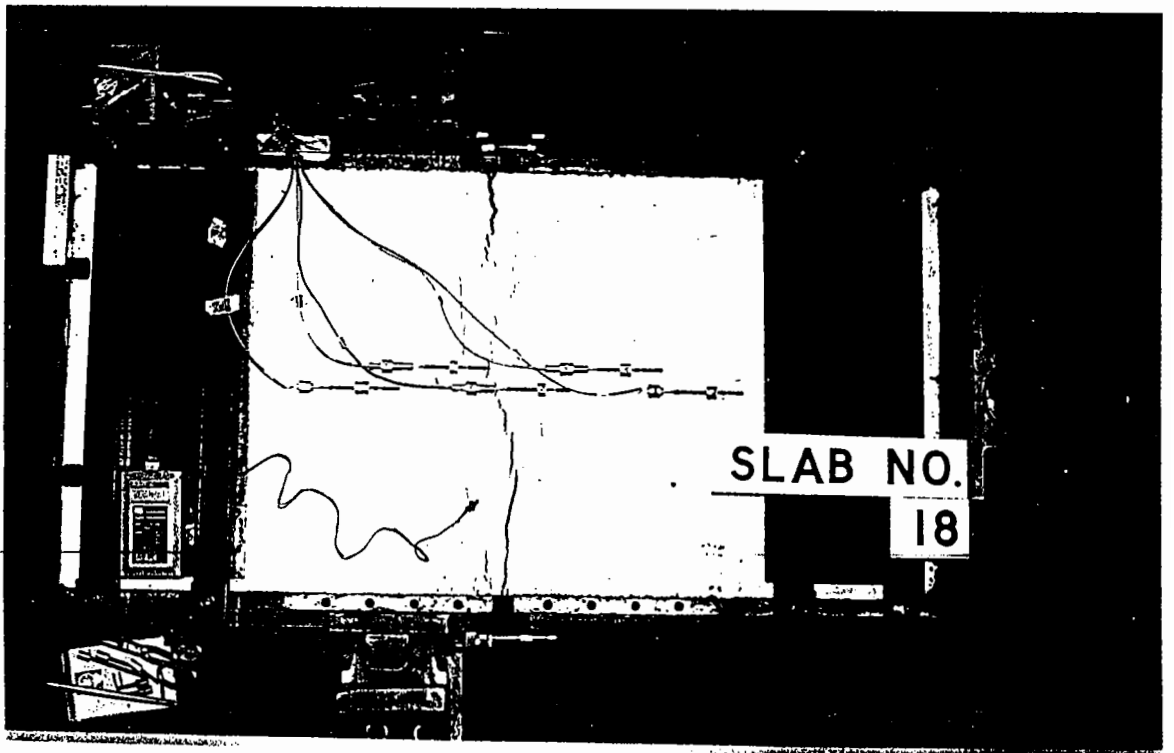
SPECIMEN NO. H/2/20C AFTER 21 TEST CYCLES (SLAB NO. 18).
